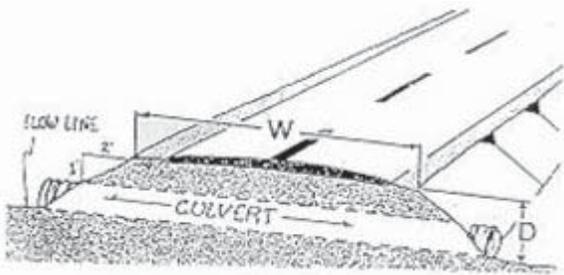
Road cross-section showing culvert slope (Skorseth, Place Culverts Correctly the First Time)
